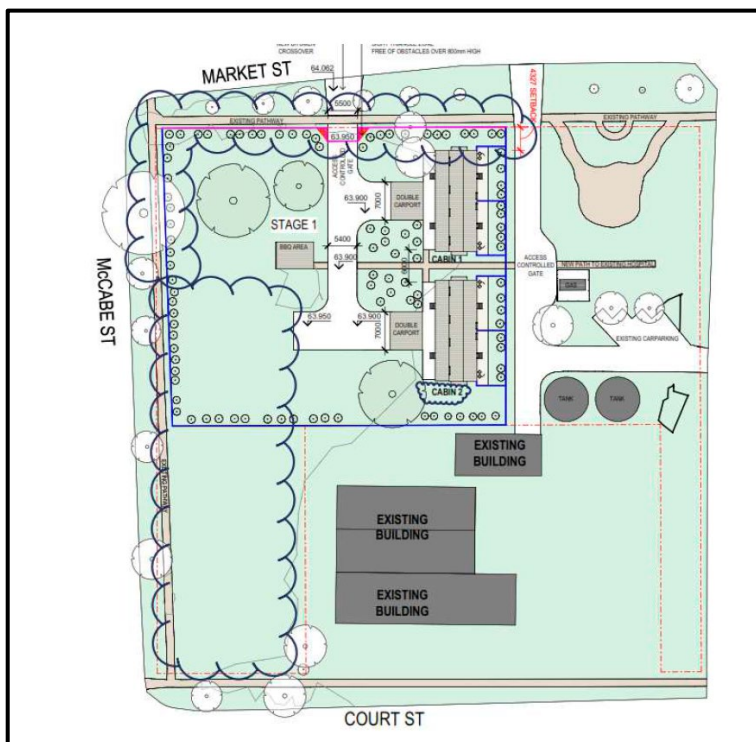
Proposed amended site plan without Cabin 2 and Stage 2 (Cabin 4) works
